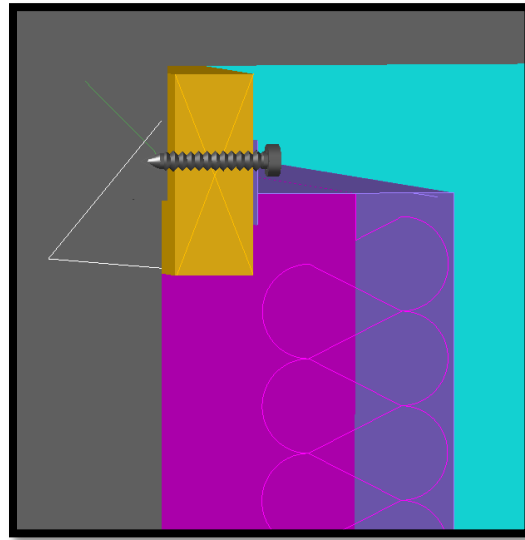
A finite detail where a screw is shown tying the gypsum board system to the concrete wall.
